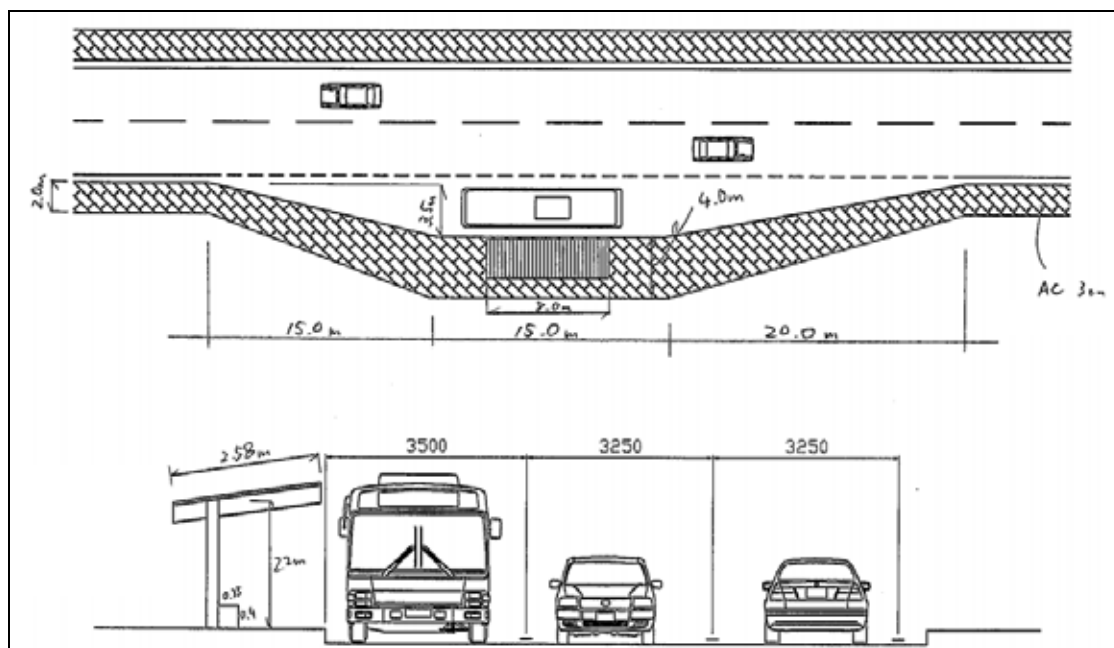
Typical Design Plan of Bus Stop Facility
